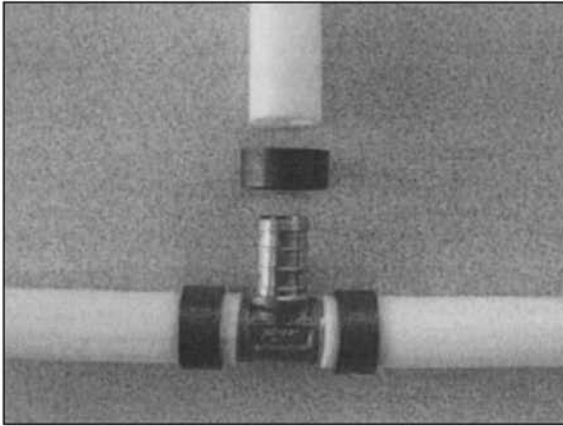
Metal Insert Fitting with Copper Crimp Ring
